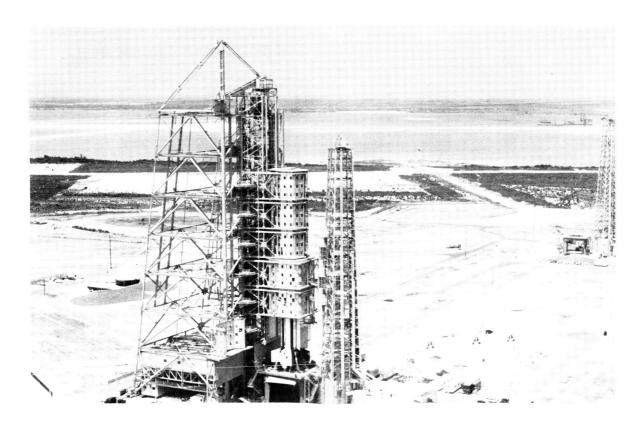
FACILITY CHECKOUT OF LAUNCH COMPLEX 37B
